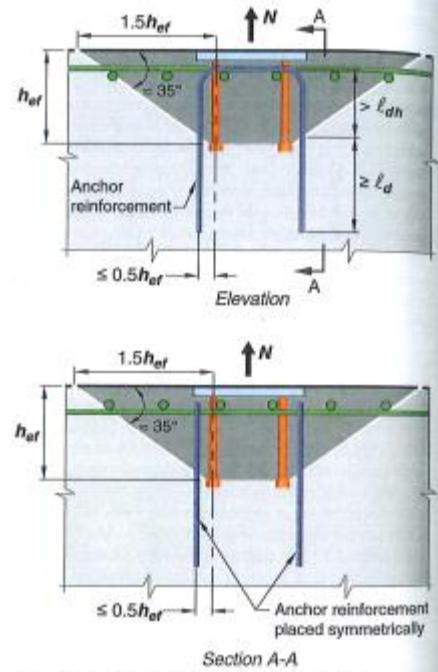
Anchor reinforcement for tension.
